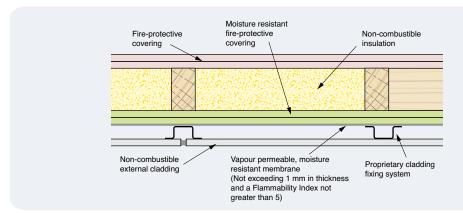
Fire-protected timber frame external walls with lightweight cladding.
